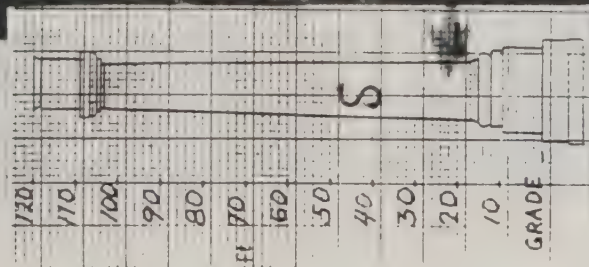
Photo Astoria Column South Face Section-OCT 1989
